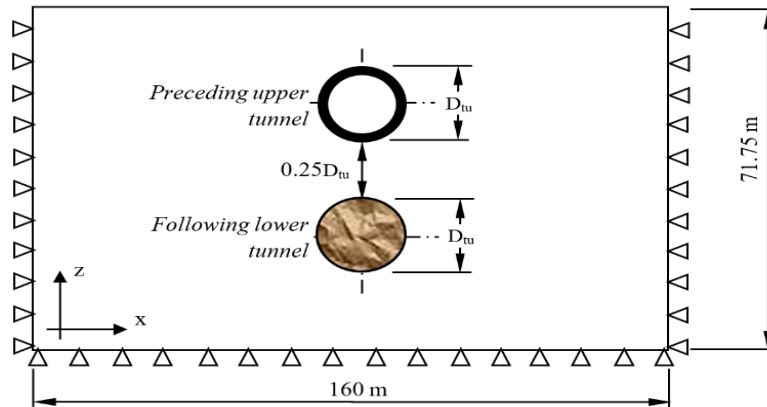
A–A: typical cross section view of the twin stacked tunnels (not scaled).
